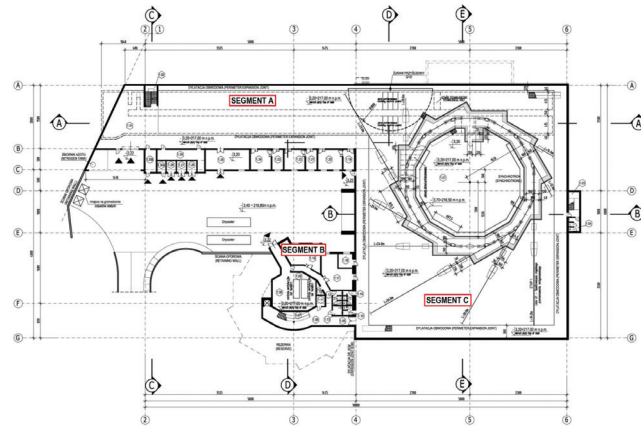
Plan view of the building "Solaris" (level -3.20 m) [9]
